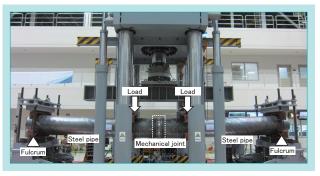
Four Point Bending Test of Mechanical Joint(1)
